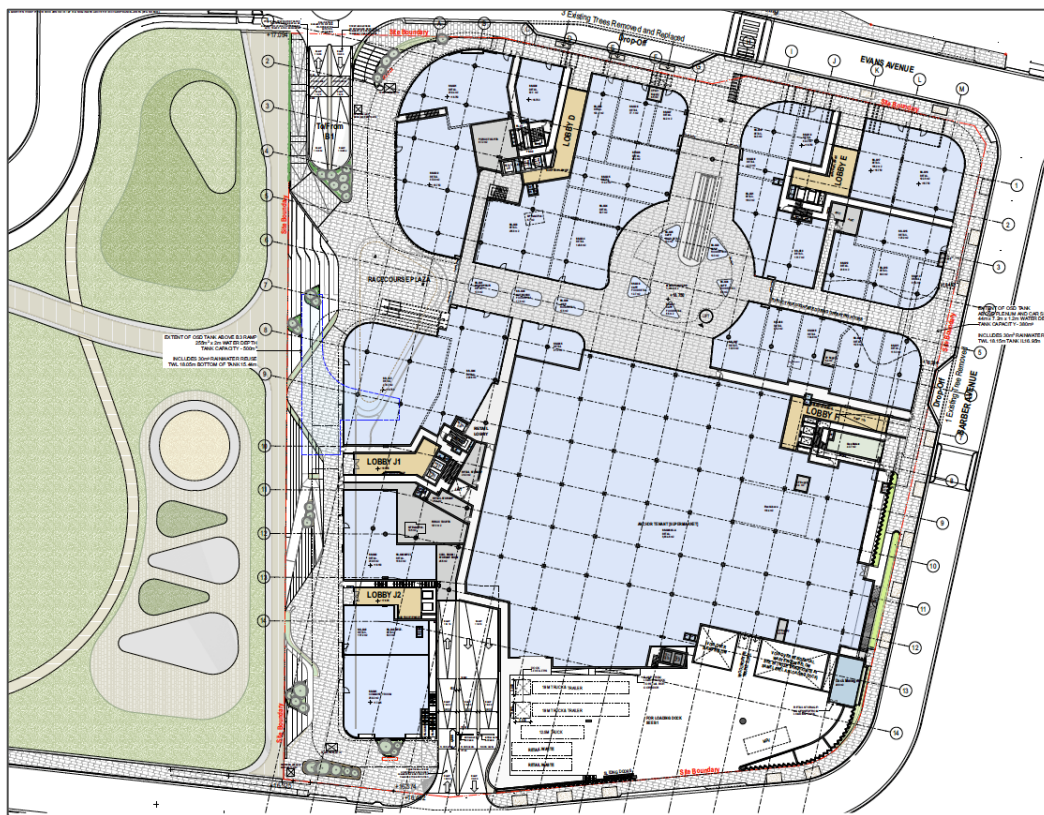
| Proposed South Site ground floor retail layout (source: SRtS)
